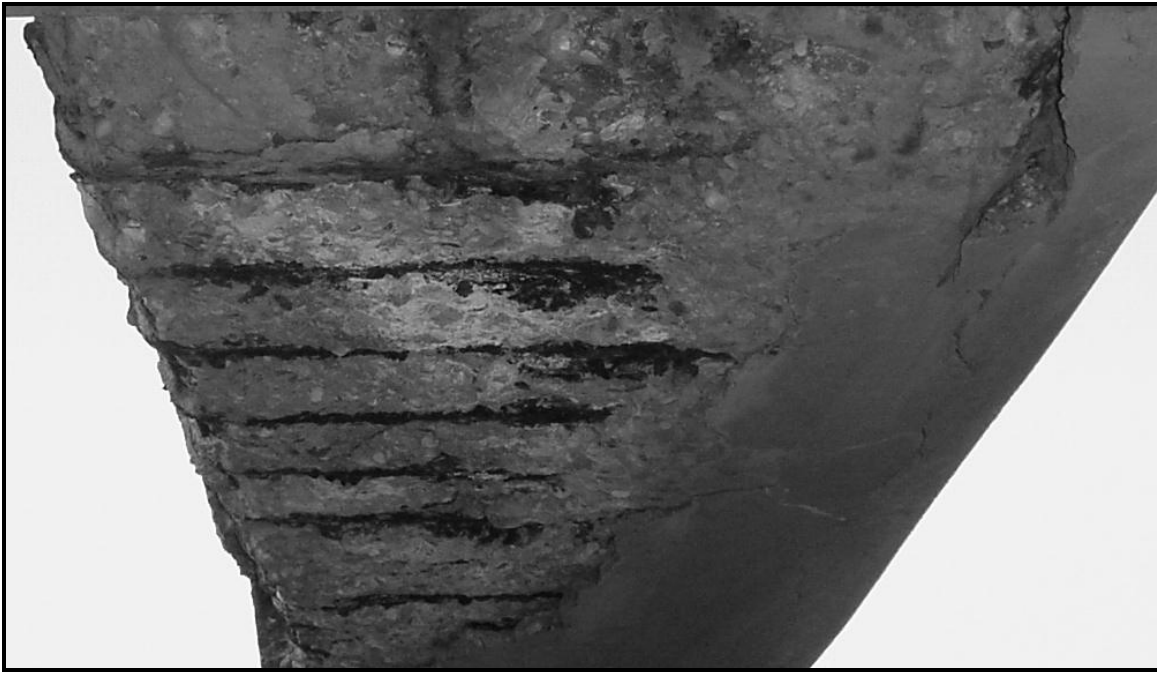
Spalling under cap beam of Bent #4S
